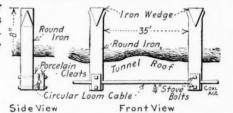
METHOD OF SUPPORTING CABLE FROM ROOF
